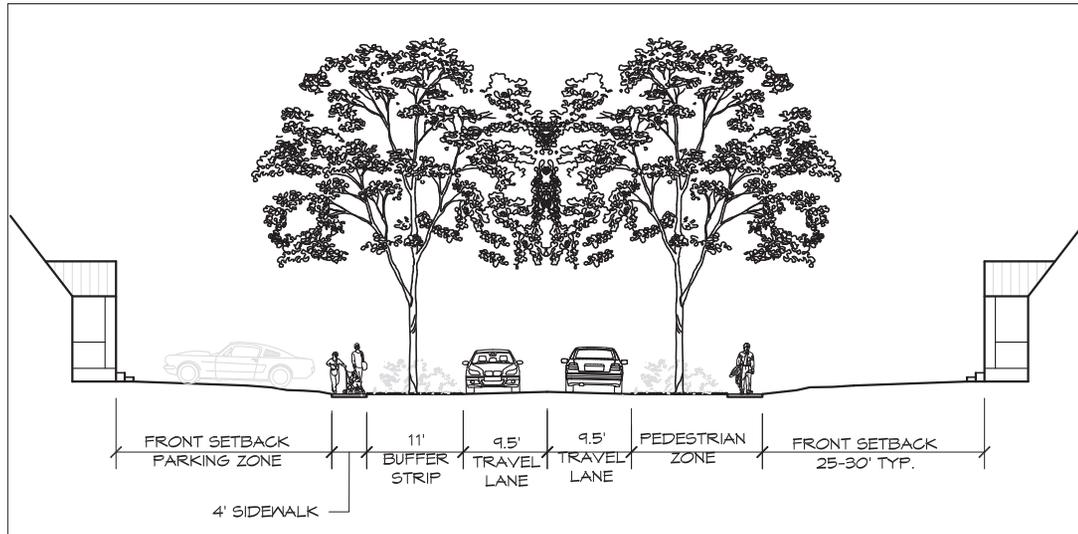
A CROSS-SECTION (TYPICAL) OF A RESIDENTIAL STREETScape, TYPE B IN OLD WINDERMERE.
